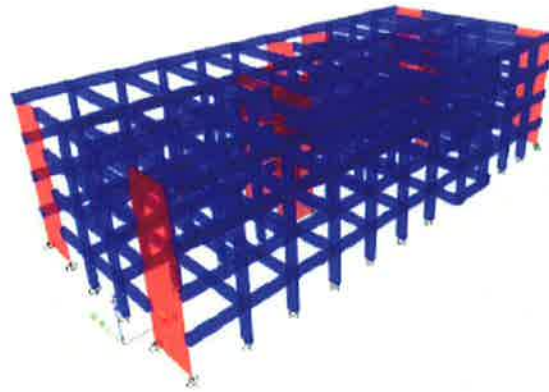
3D View 4 Storey Building with Shear Wall.
